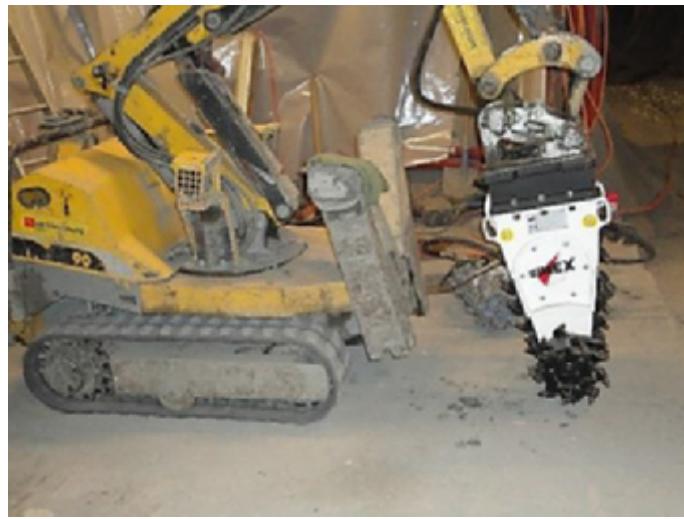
Simex TF 100 cutter head with Brokk 90
